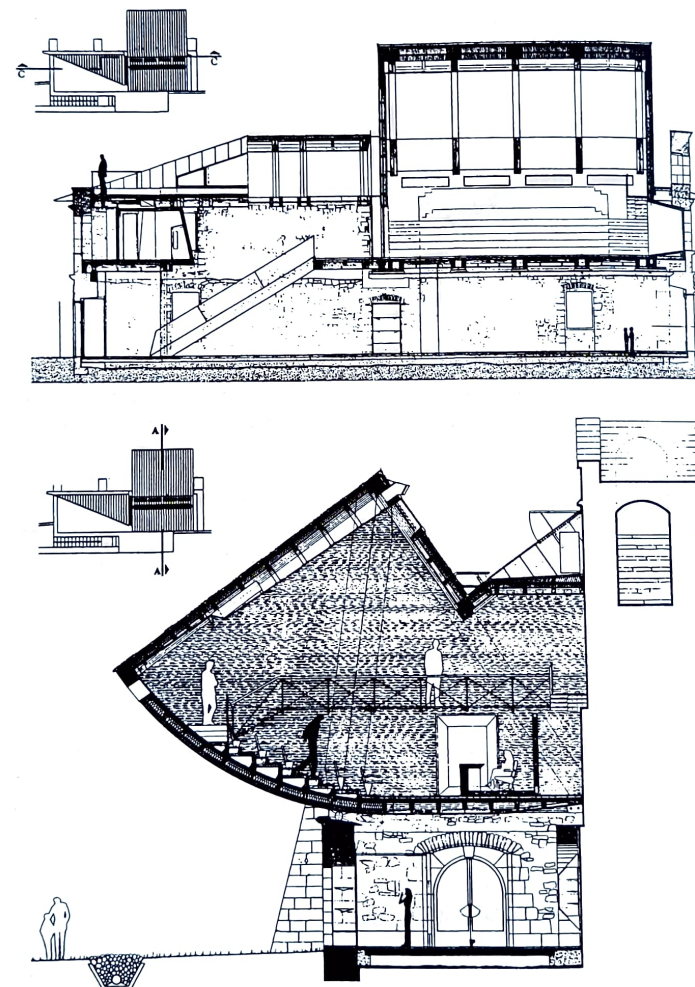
Longitudinal section and cross section of the new volume added to the Chevalier building. The structure of laminated fir is externally clad with copper panels.
